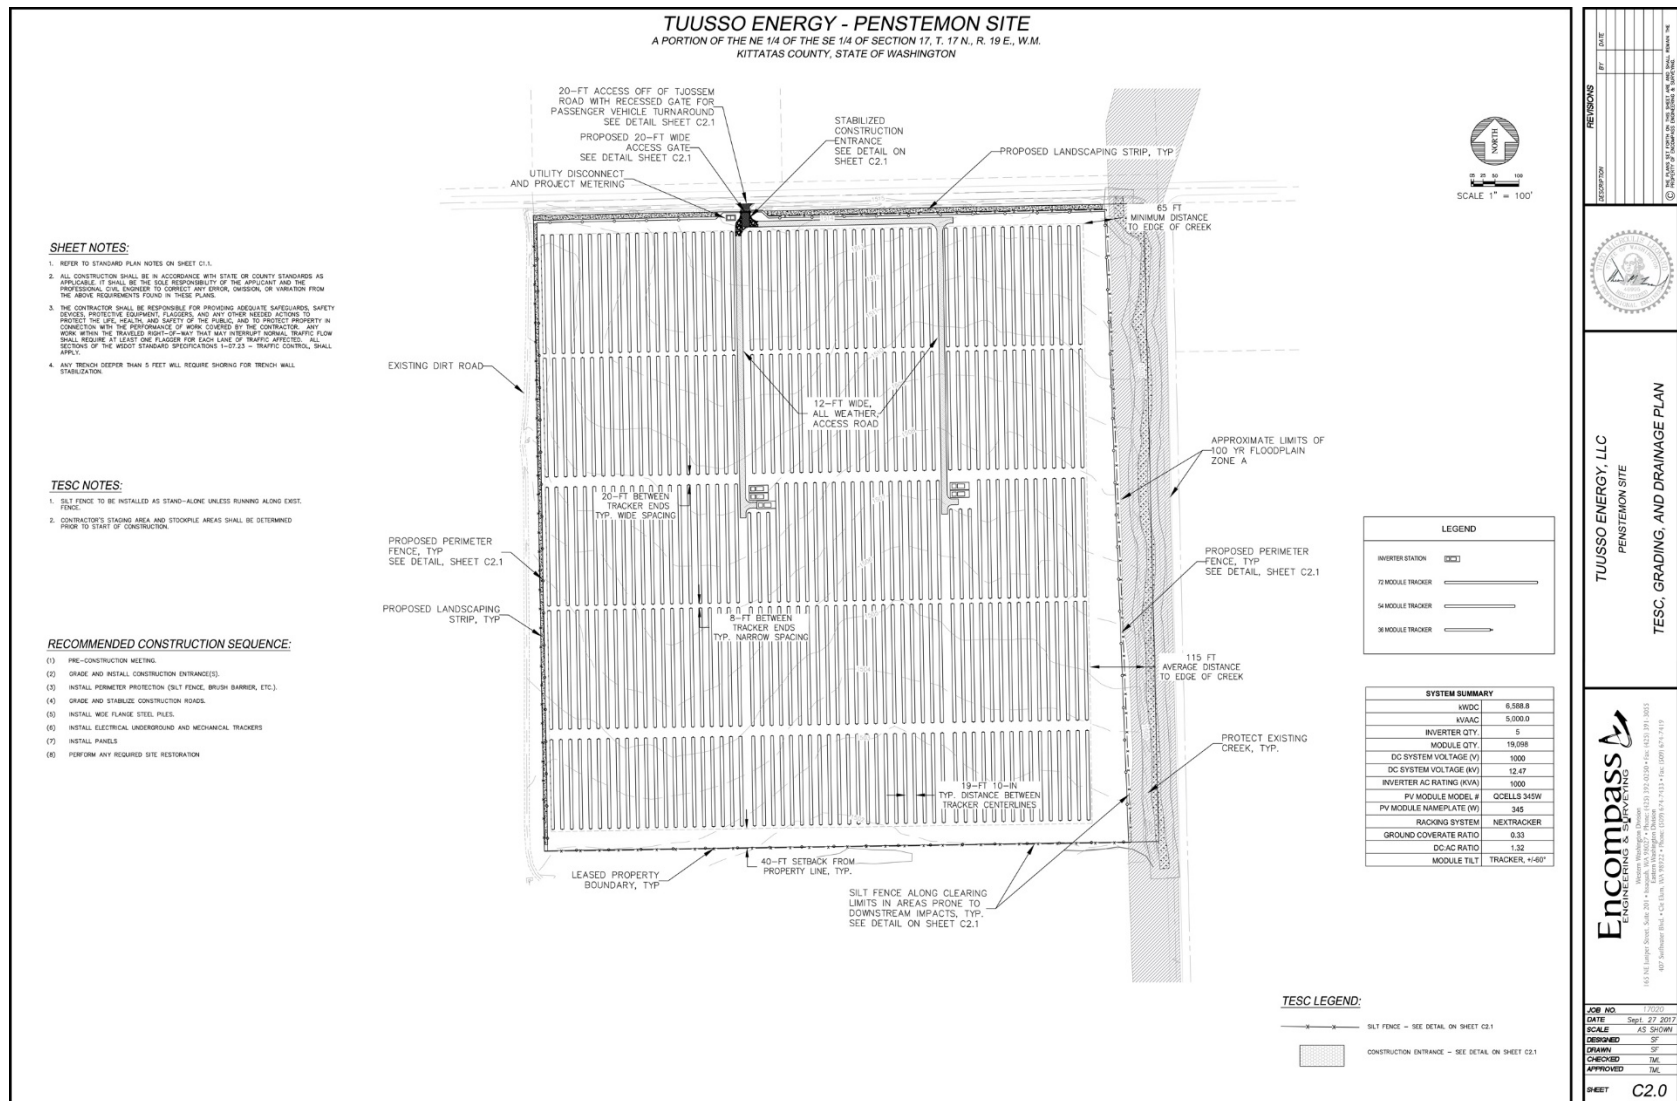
Penstemon Solar Project preliminary project plan.
